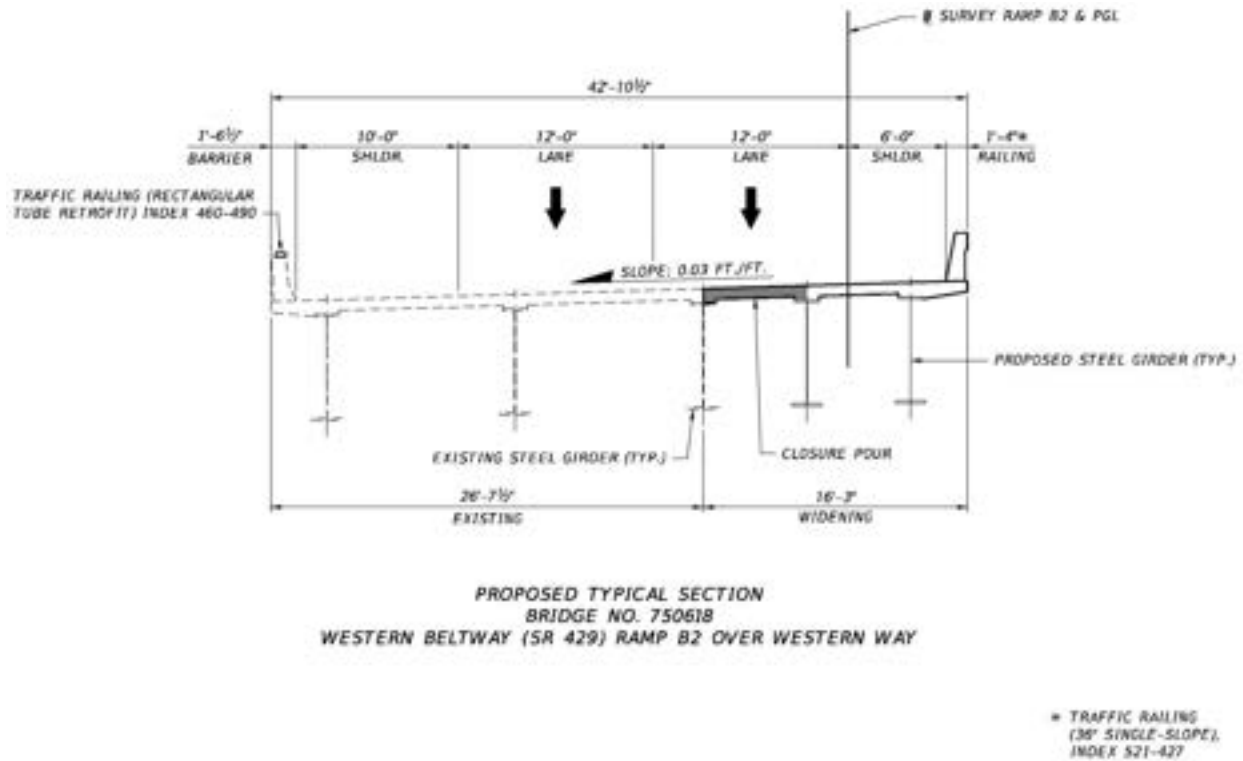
SR 429 over Western Way Proposed Typical Section
